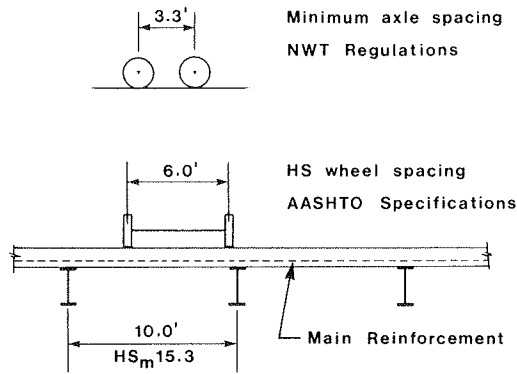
HS measurement for concrete deck slab with main reinforcement perpendicular to traffic.
